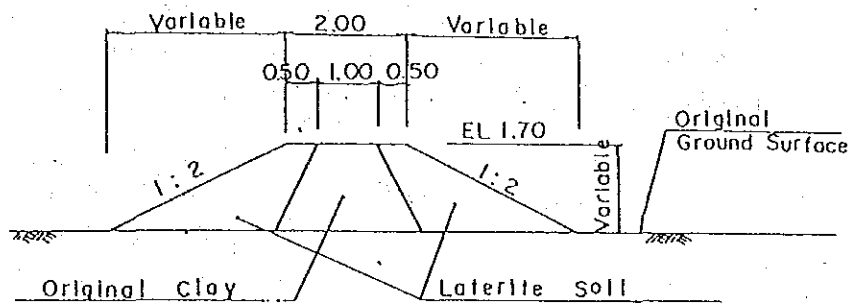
Standard Cross Section of Cofferd Dam
